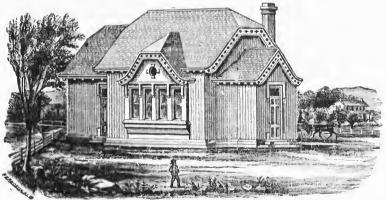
Design No. 7.—Adapted to Ground Plan in Fig. 65.
